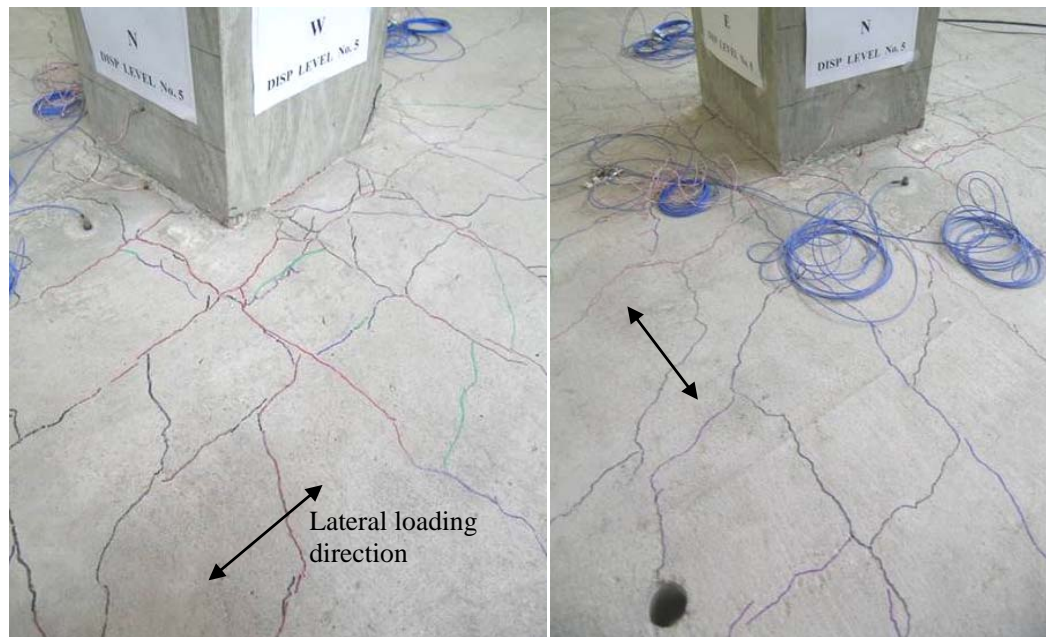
Damage in specimen LG0.5 at 1.25% drift
